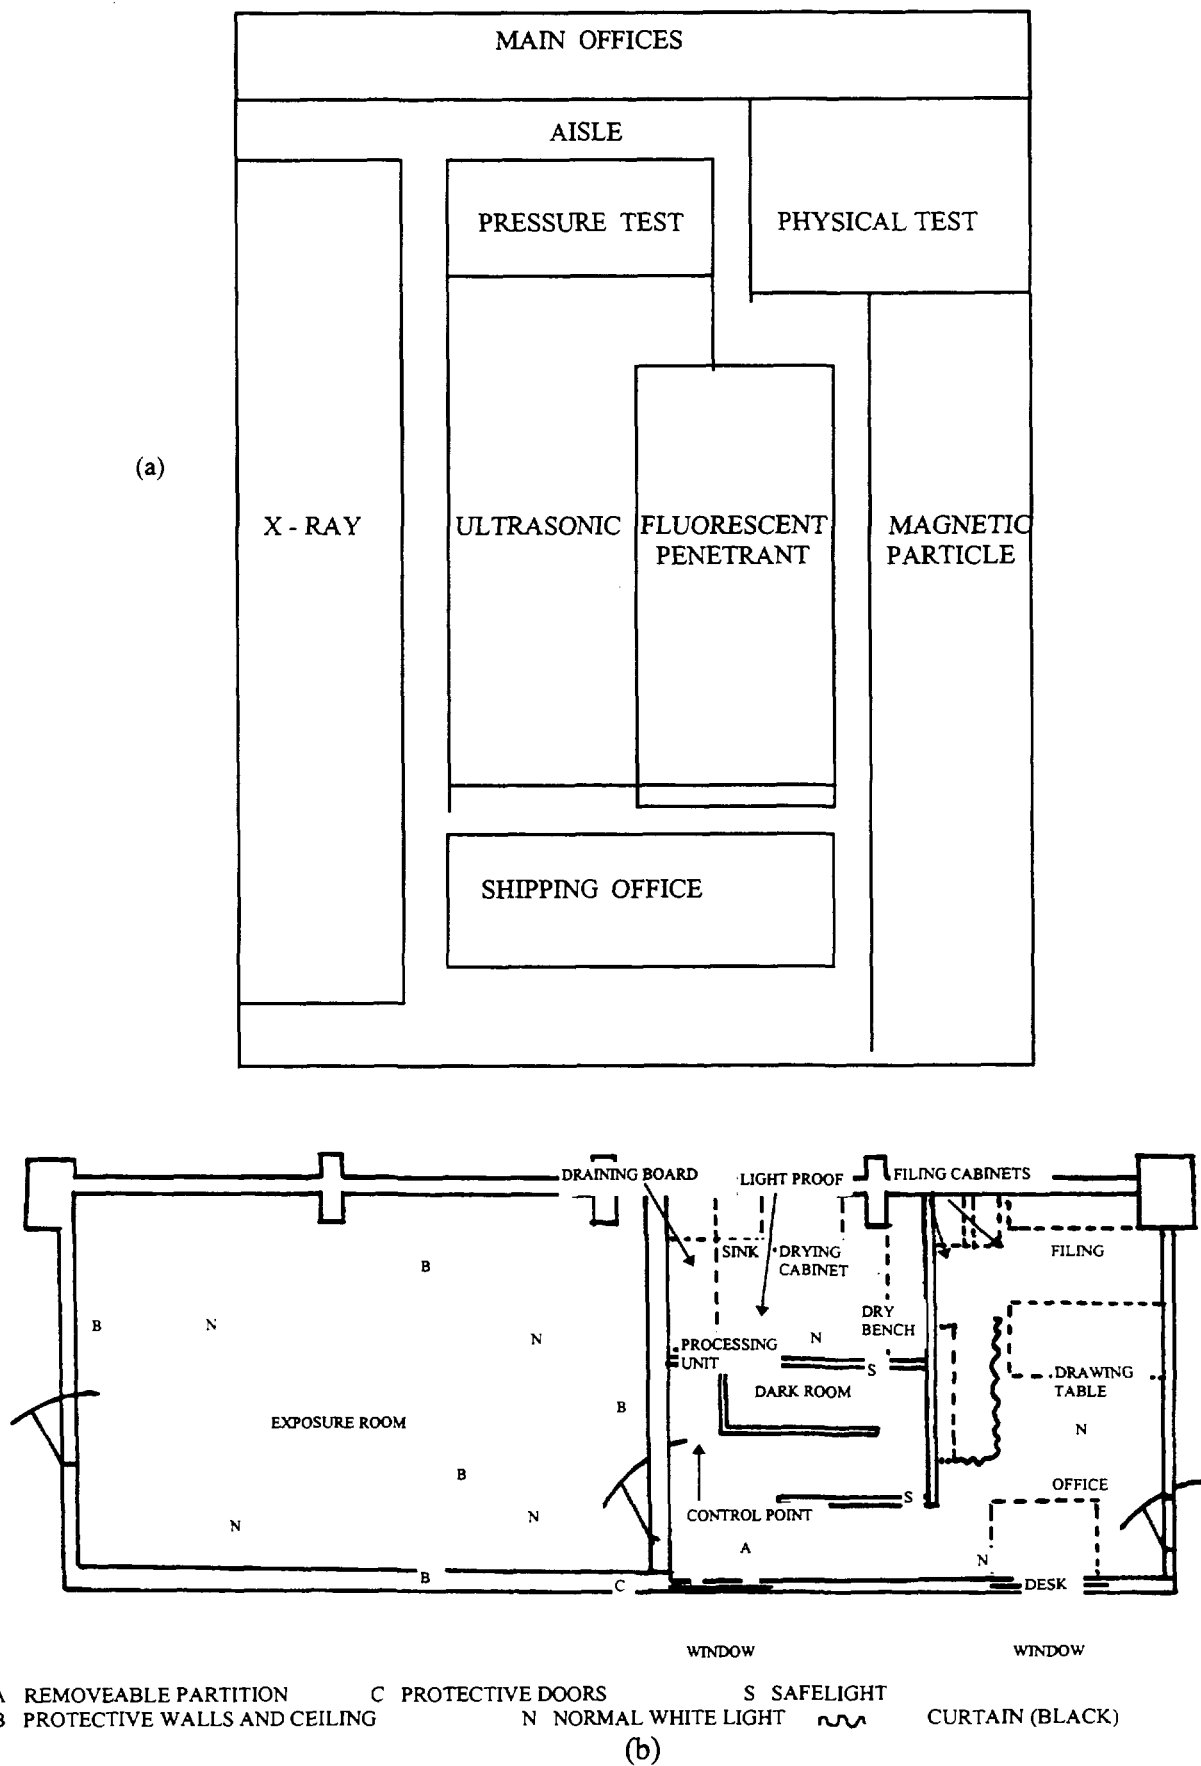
(a) Typical NDT laboratory floor plan.
